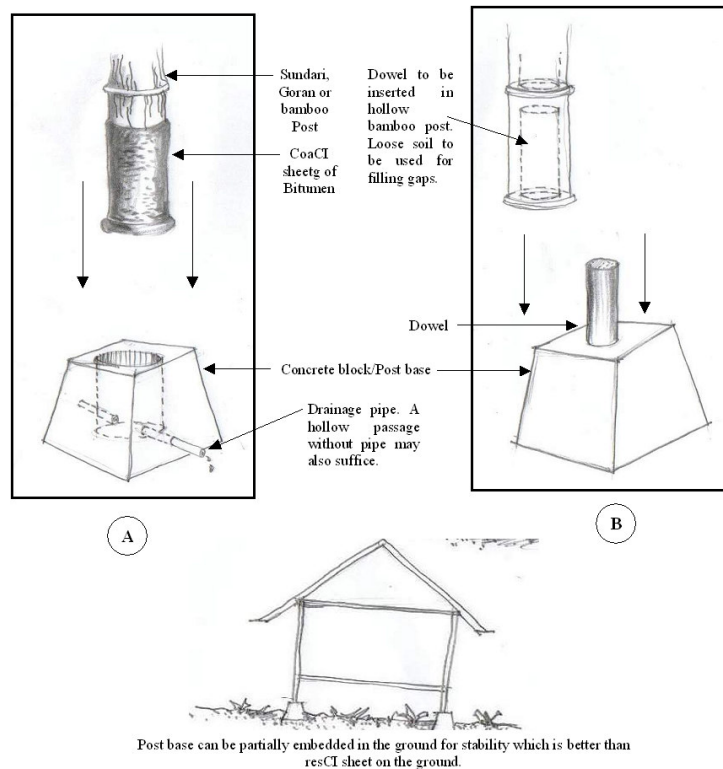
PROPOSED CONCRETE BLOCKS FOR PROTECTING BAMBOO POSTS
